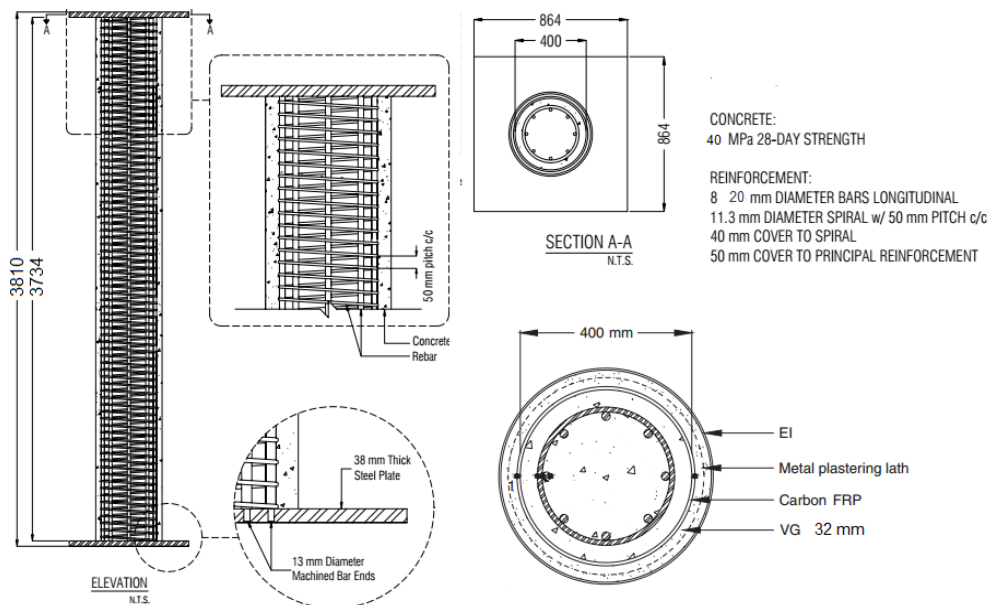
Column (1): Column Dimensions and Reinforcement Details [6]
